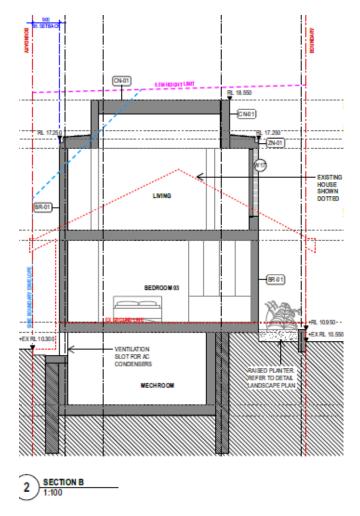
the extent of the proposed boundary envelope exceedance as measured at Section B (excerpt from architectural plans)
